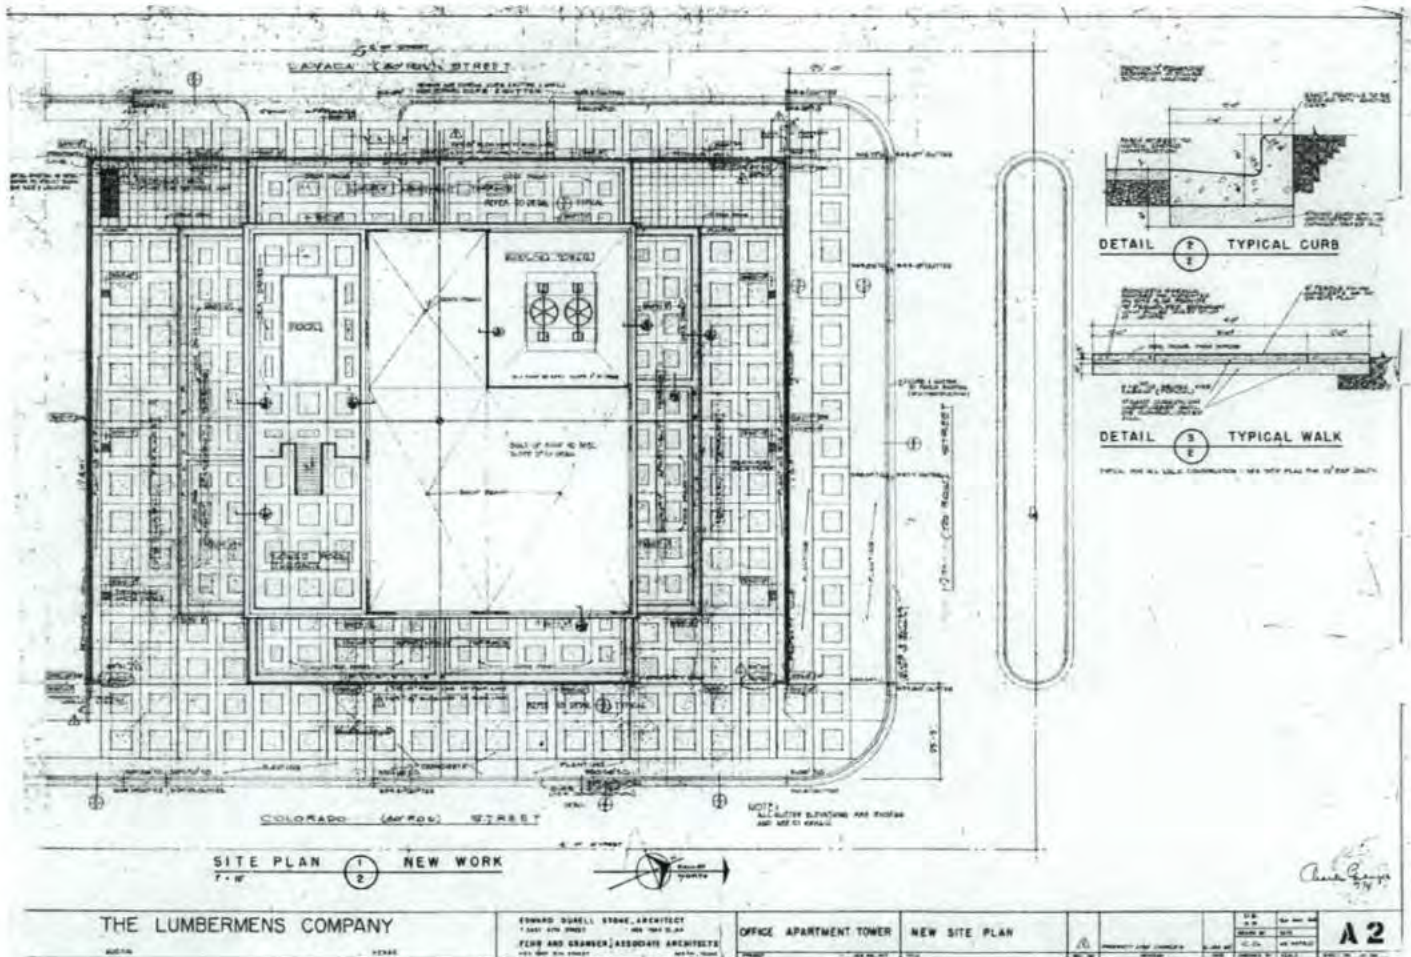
Site plan for the Westgate Tower, showing the patterned concrete at grade and at the Level 10 terraces.
